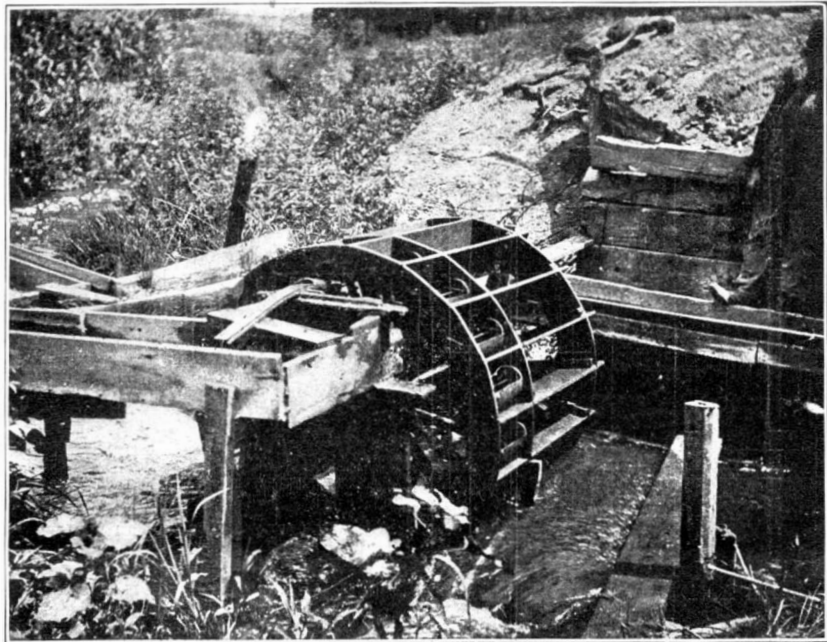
PLATE I.—CURRENT WHEEL, FARMERS' AND GARDENERS' DITCH, COLORADO.
